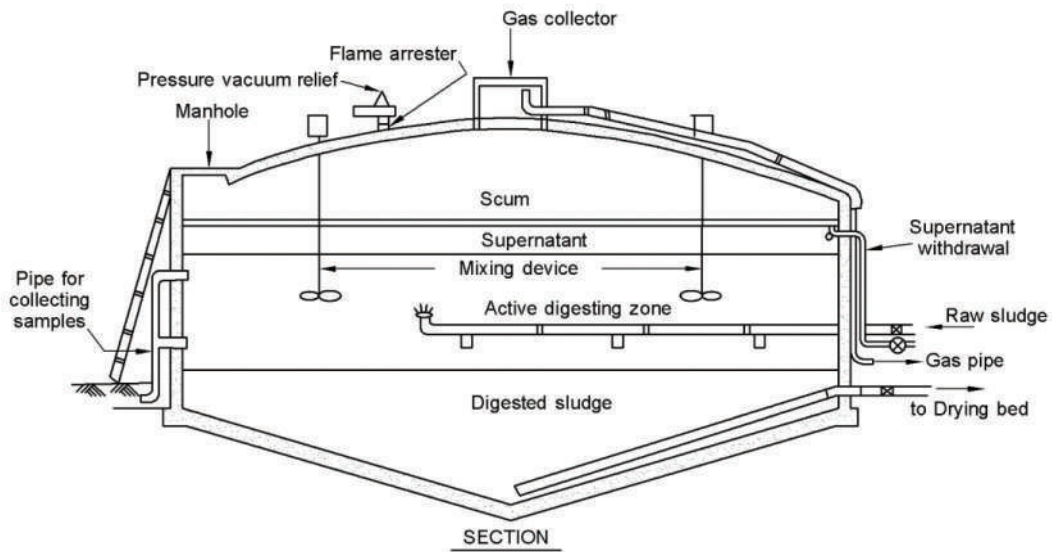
Typical Details of Low rate Sludge Digester
